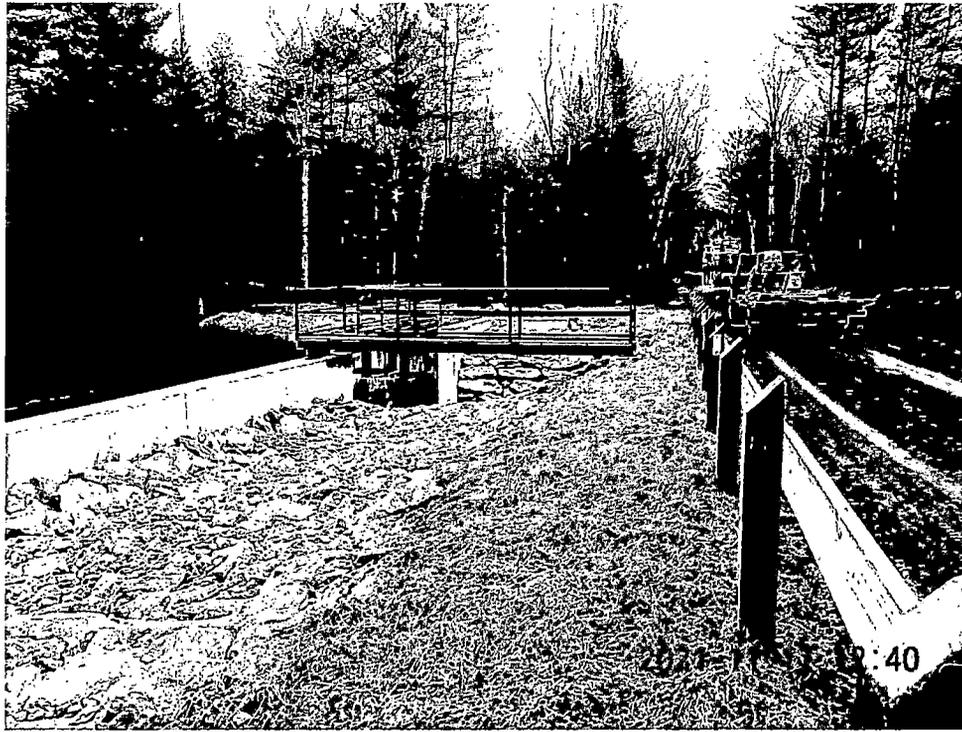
New Weeks Crossing dam looking southeast 11/2021.
